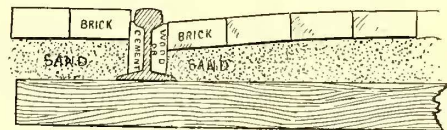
SECTION OF T RAIL CONSTRUCTION IN DES MOINES.
